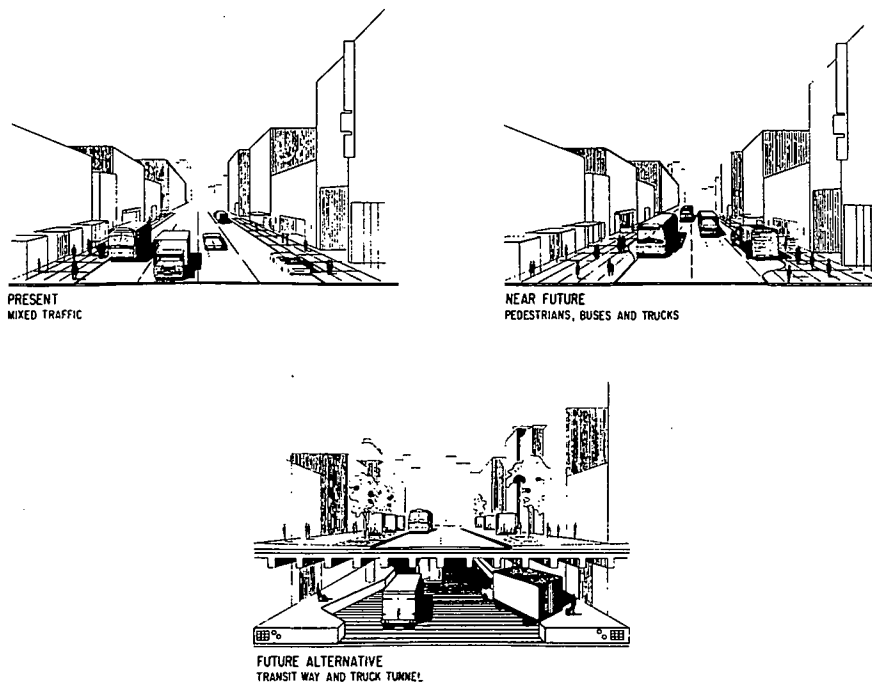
Short- and long-range proposed improvements for traffic in Dallas CBD.
